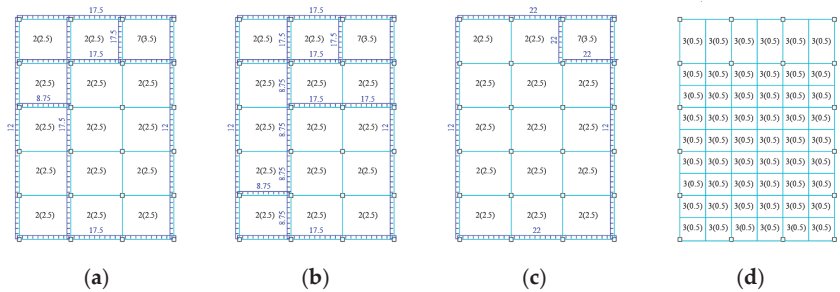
Load plan layout of frame KJ1. (a) First storey; (b) Second storey; (c) Third storey; (d) Fourth storey.
